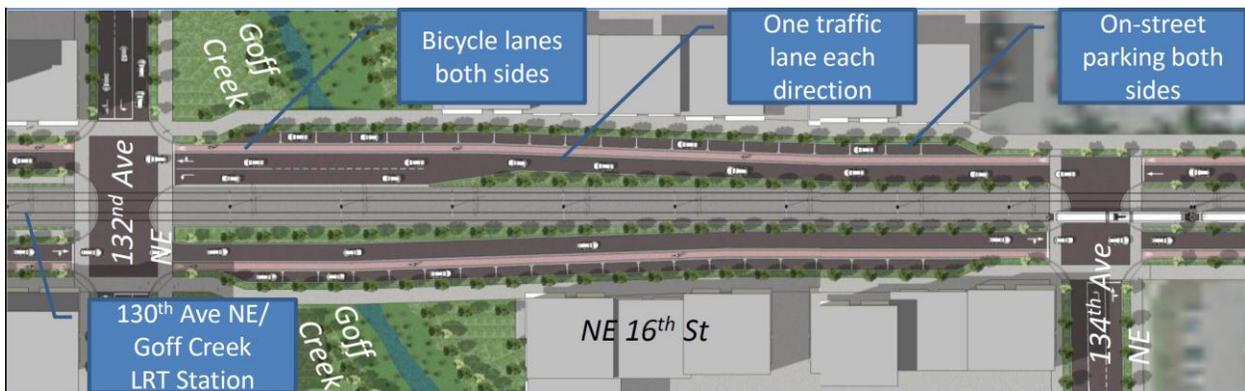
Planned Configuration of NE 16th Street east of the 130th Avenue NE/Goff Creek Light Rail Station
